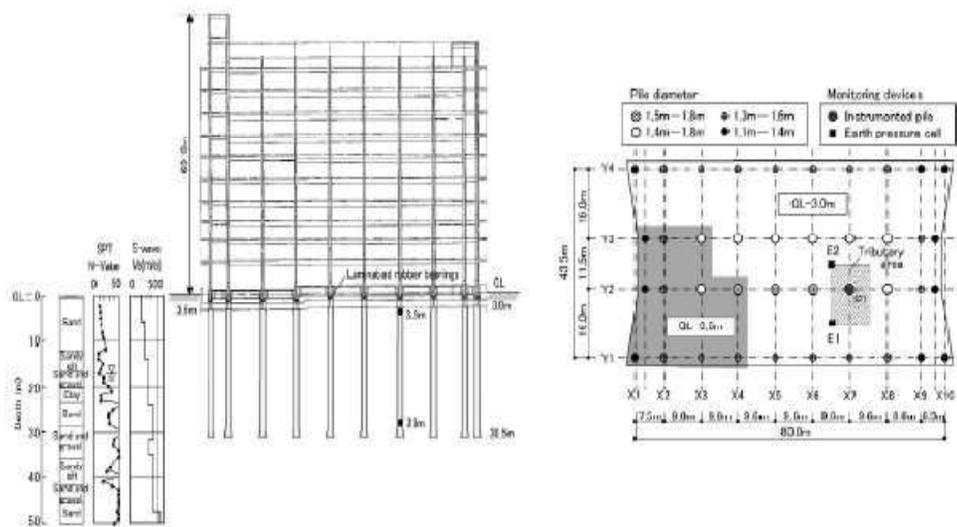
Soil profile, foundation plan and elevation of eleven story base-isolated office building (after Yamashita et al., 2011)
